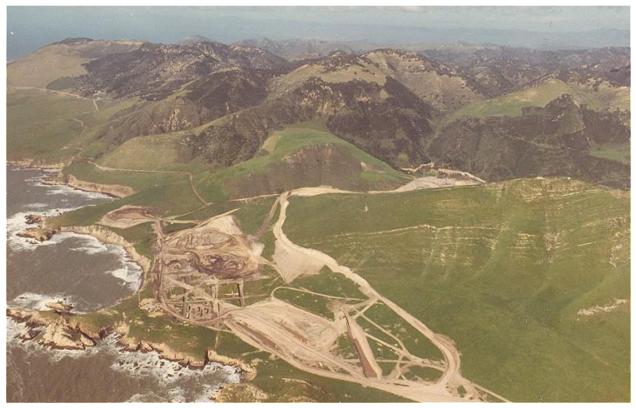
Aerial photograph showing site excavation work to create the flat terrace just above sea level and the leveled plateau (upper terrace) in the hillside above to construct the Diablo Canyon Power Plant in March 1969. Source: Pacific Gas and Electric Company.
